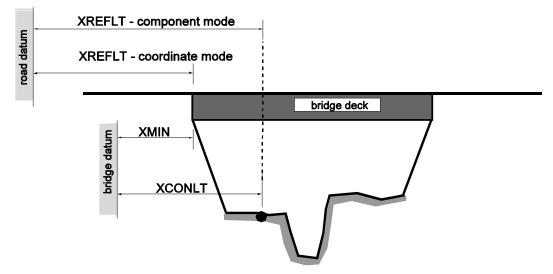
Definition sketch: application of BP record for datum correction between bridge-opening and road-grade sections.
